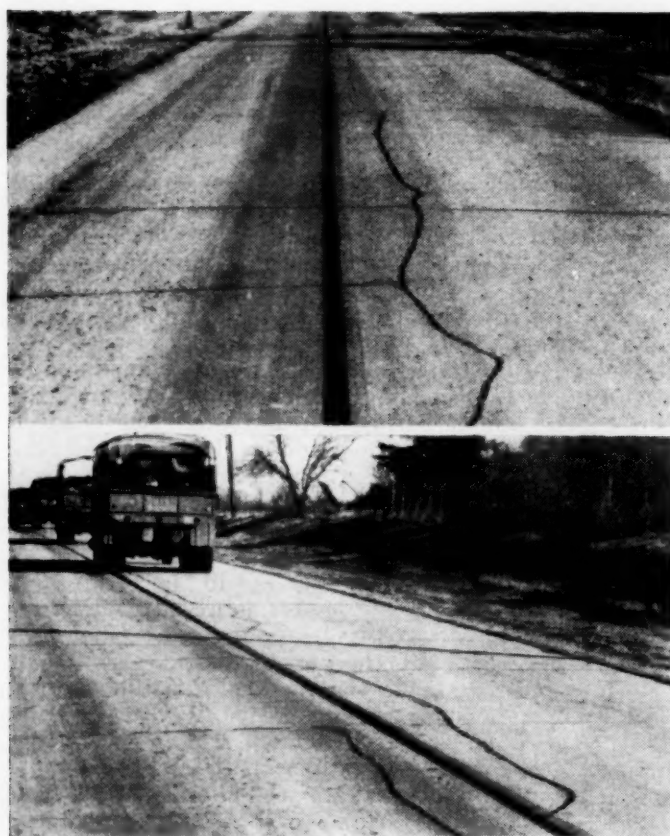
LONGITUDINAL CRACKING IN NEBRASKA PAVEMENTS WITH DUMMY CENTER JOINT, LAID IN 1935-36.
